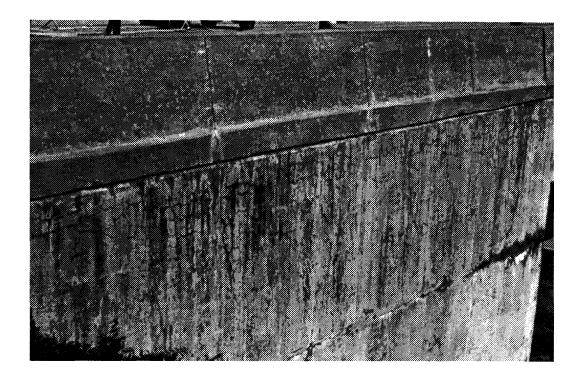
Wingwall on U.S. 301 bridge over I-295.
